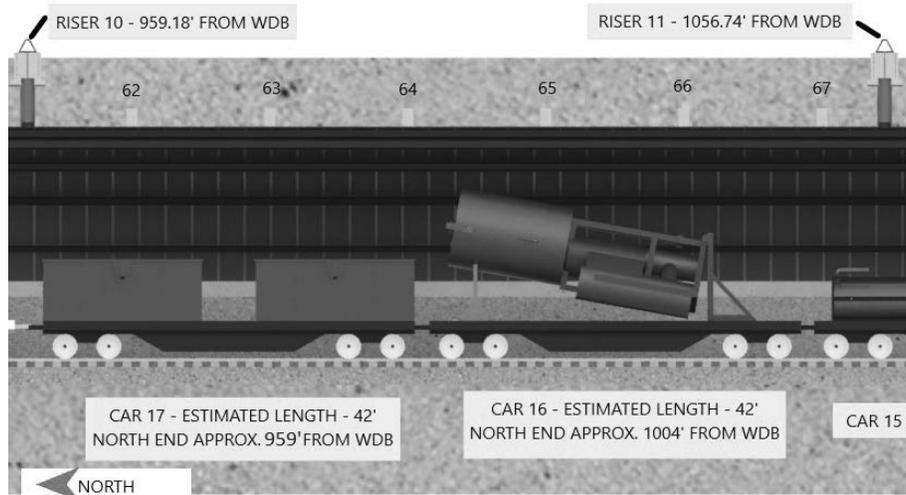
Riser 10 to Riser 11 Tunnel Section.
